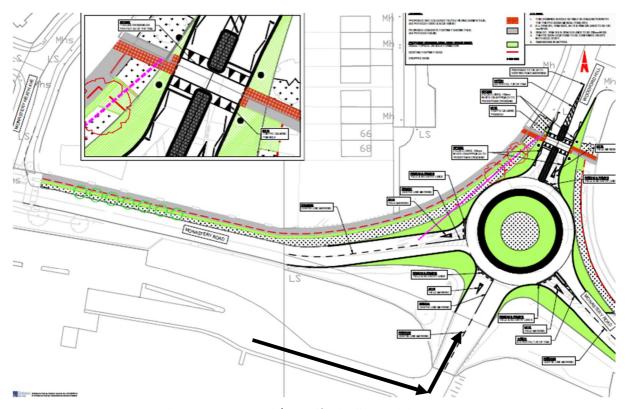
Site access onto the Monastery Road / Woodford Hill Roundabout
